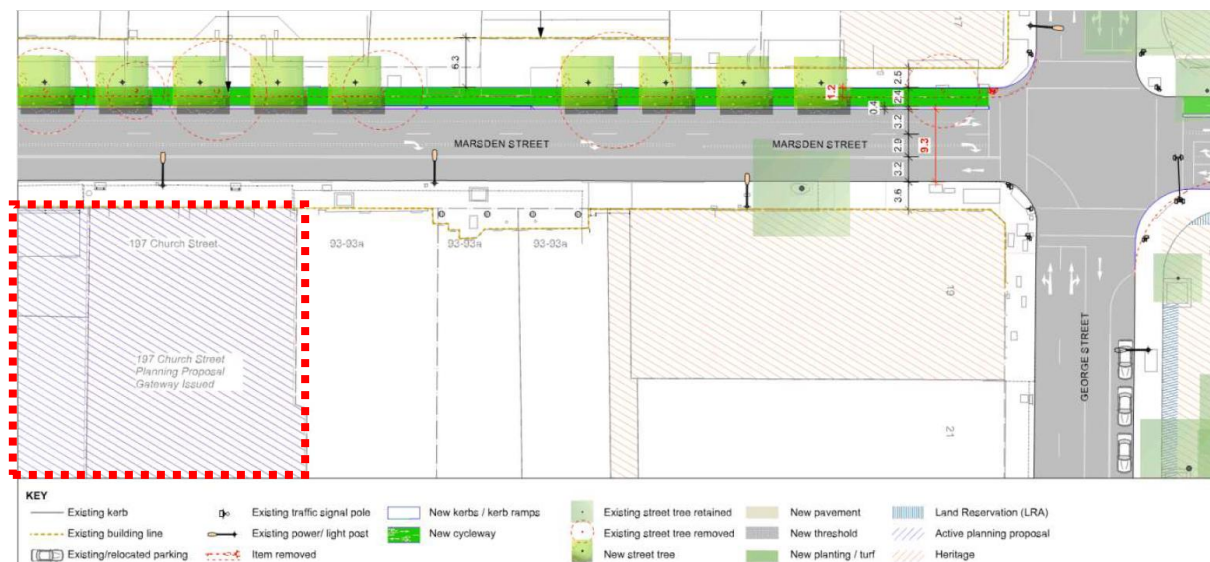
Marsden Street Cycleway Concept Design – opposite 197-207 Church Street and 89 Marsden Street, Parramatta
